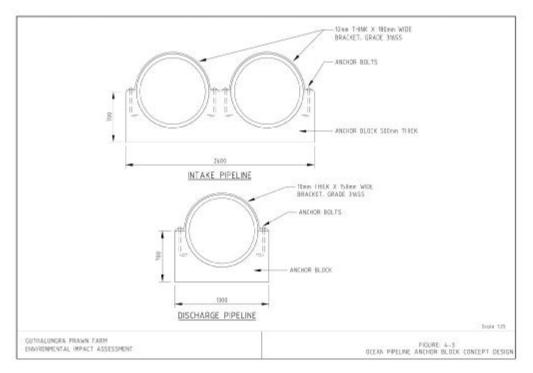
Ocean Pipeline Anchor Block Concept Design
